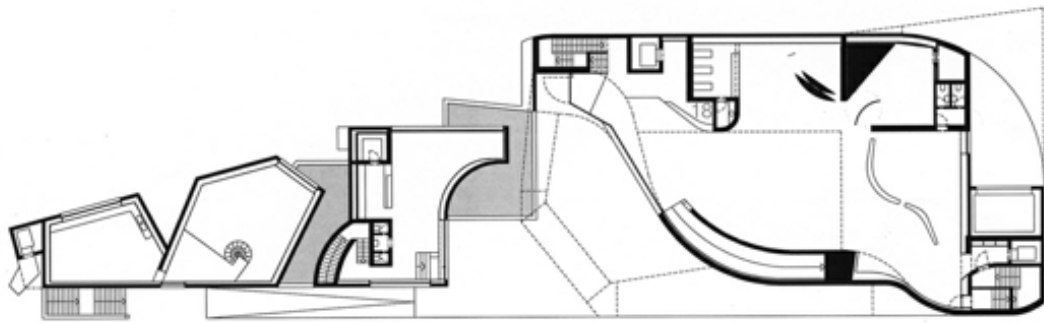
Siza Vieira, Iberê Camargo Foundation, Porto Alegre, Brasil, 1998-2006 - 1st floor plan.
